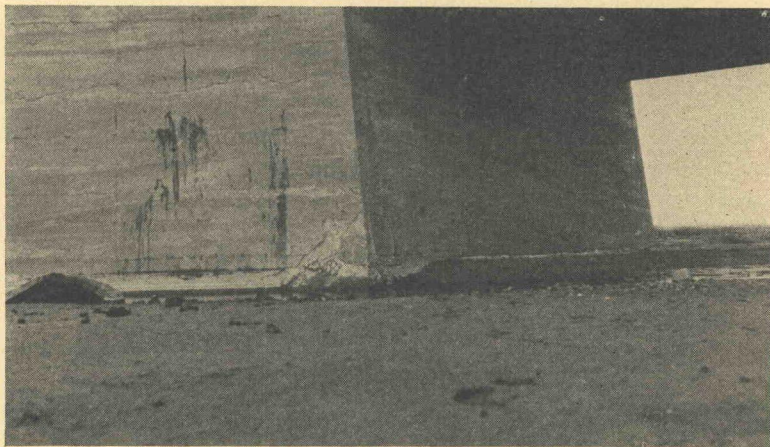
Sand Gravel Concrete Abutment of Garden City Bridge over the Arkansas River
